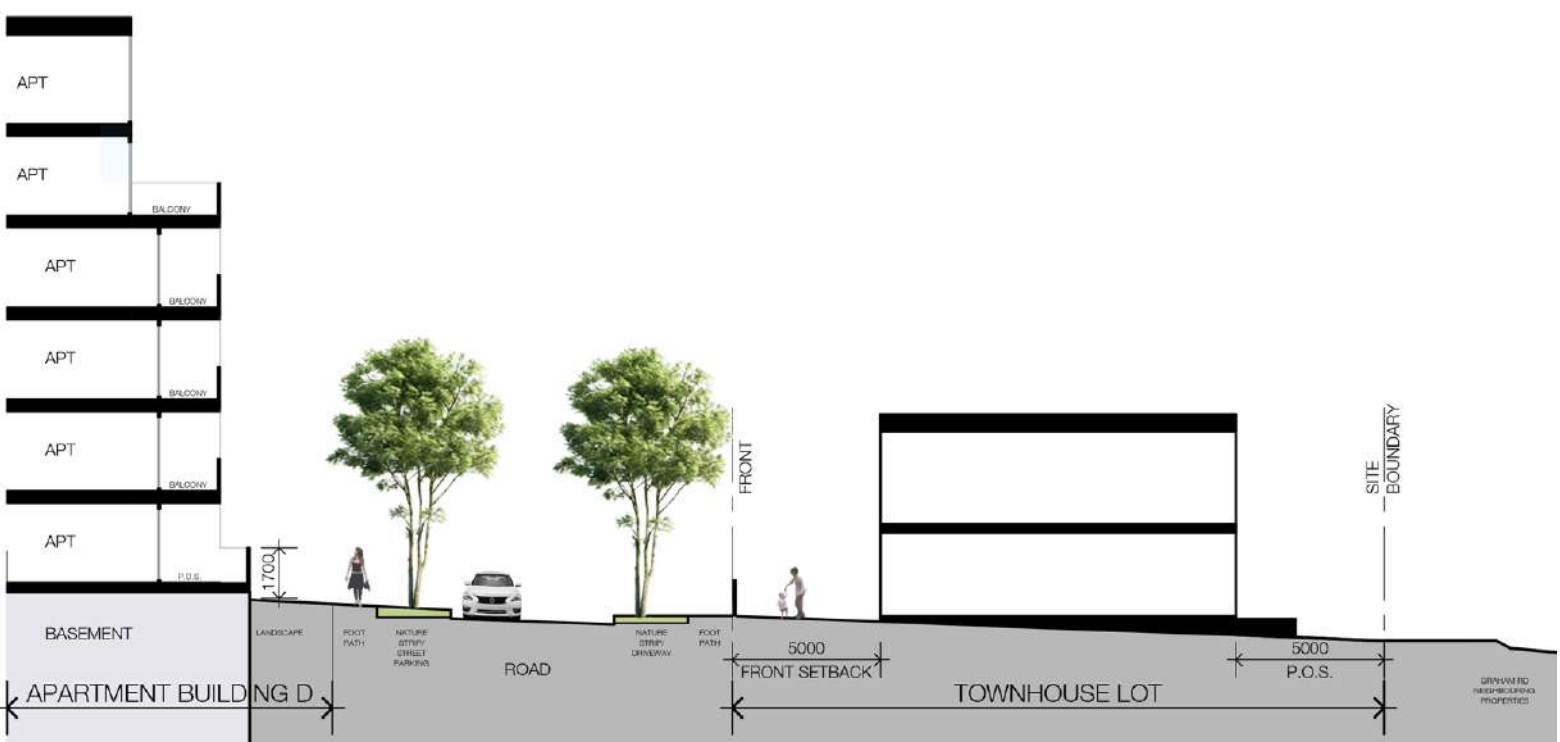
Section J - Through Eastern Townhouse Lot and Building D
